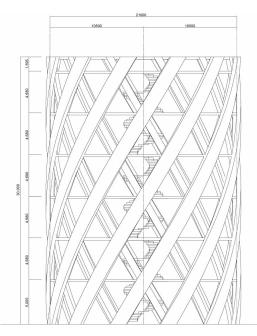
d - Elevation; Dimensions in [mm]
